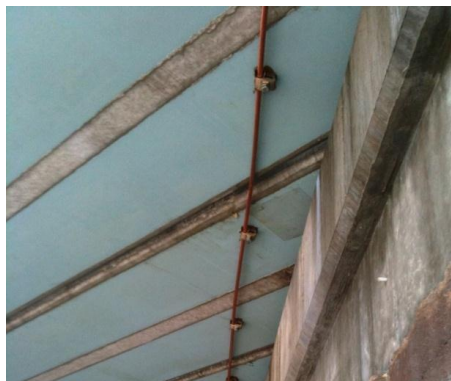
Concrete Encased Steel Deck Beam
